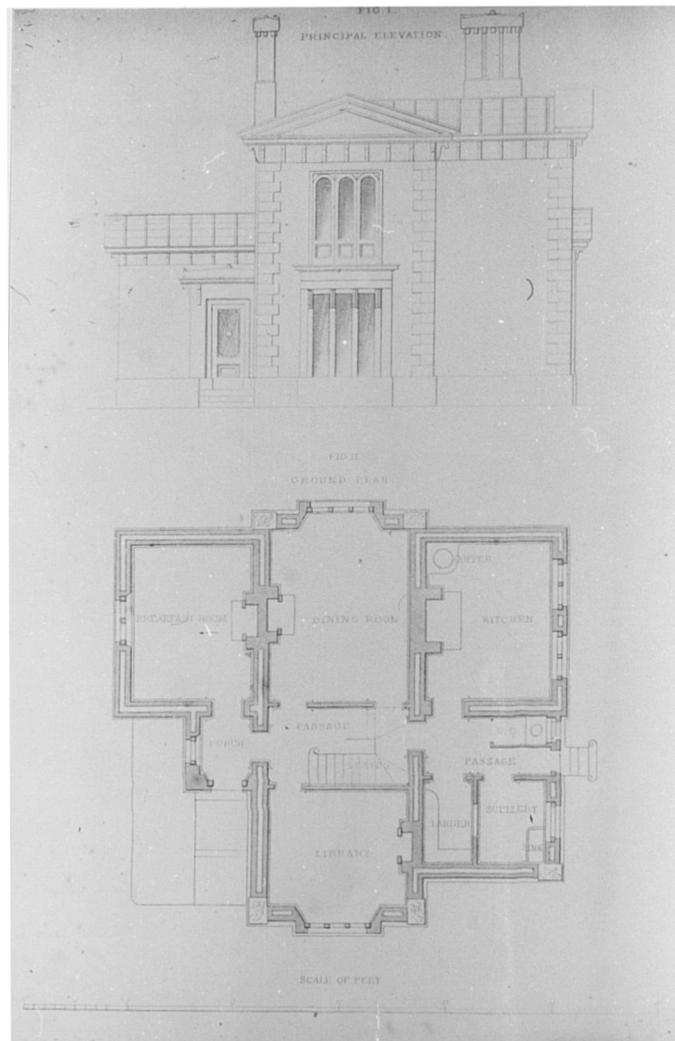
Plan and elevation of Silverlock's hollow walls.
